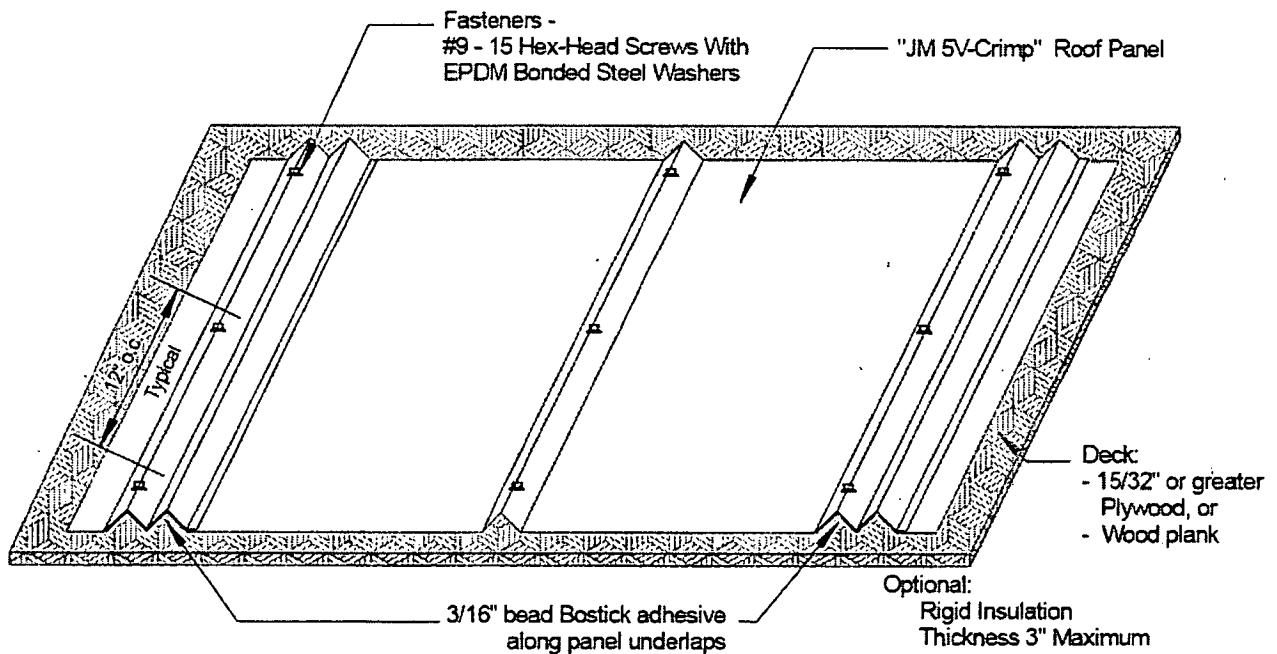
B - Typical Assembly Isometric View (METHOD 1)
